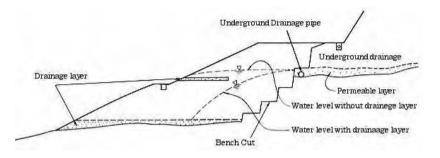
Groundwater Drainage Facilities and Drainage Layer for the Embankment on Inclined Ground
